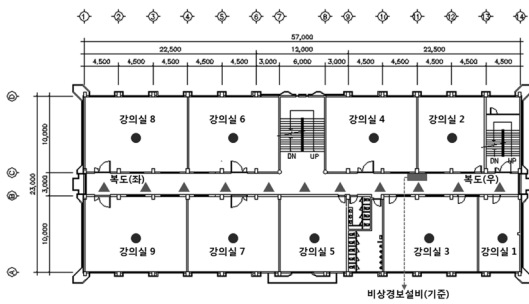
Plan of subject building and location of machinery tool & sound-receiving point.
